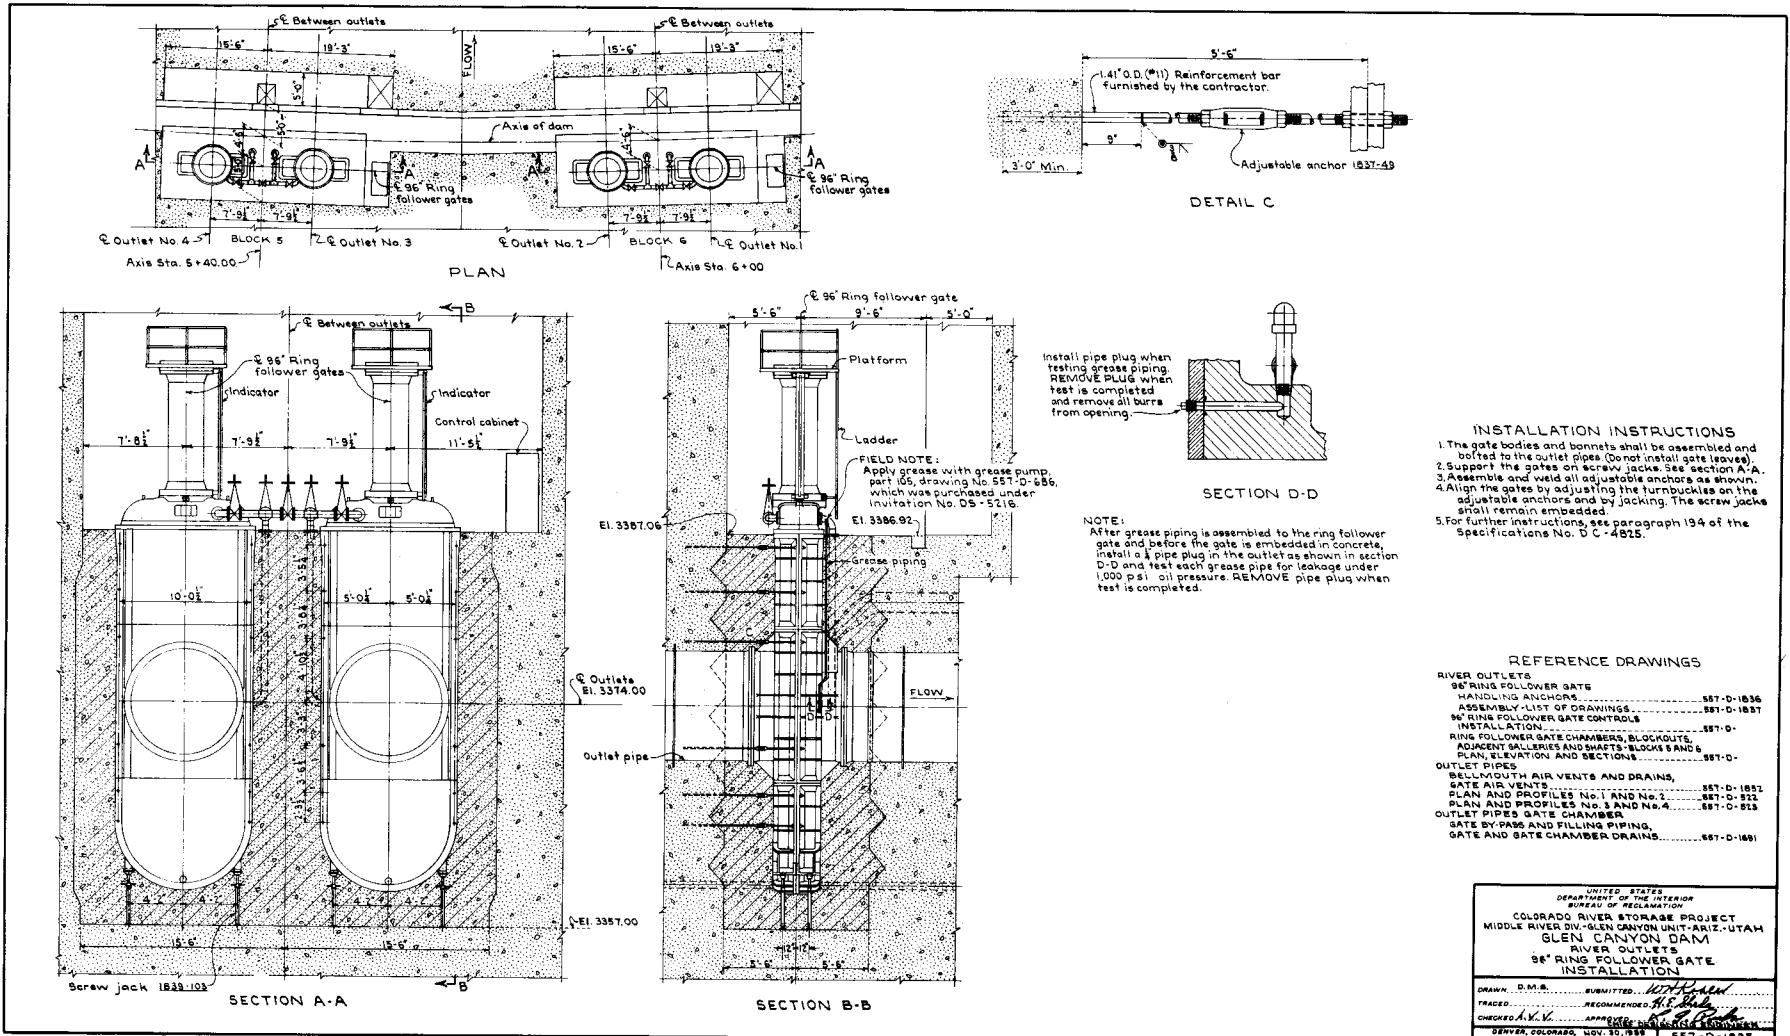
River outlets, 96-inch ring-follower gate installation.
